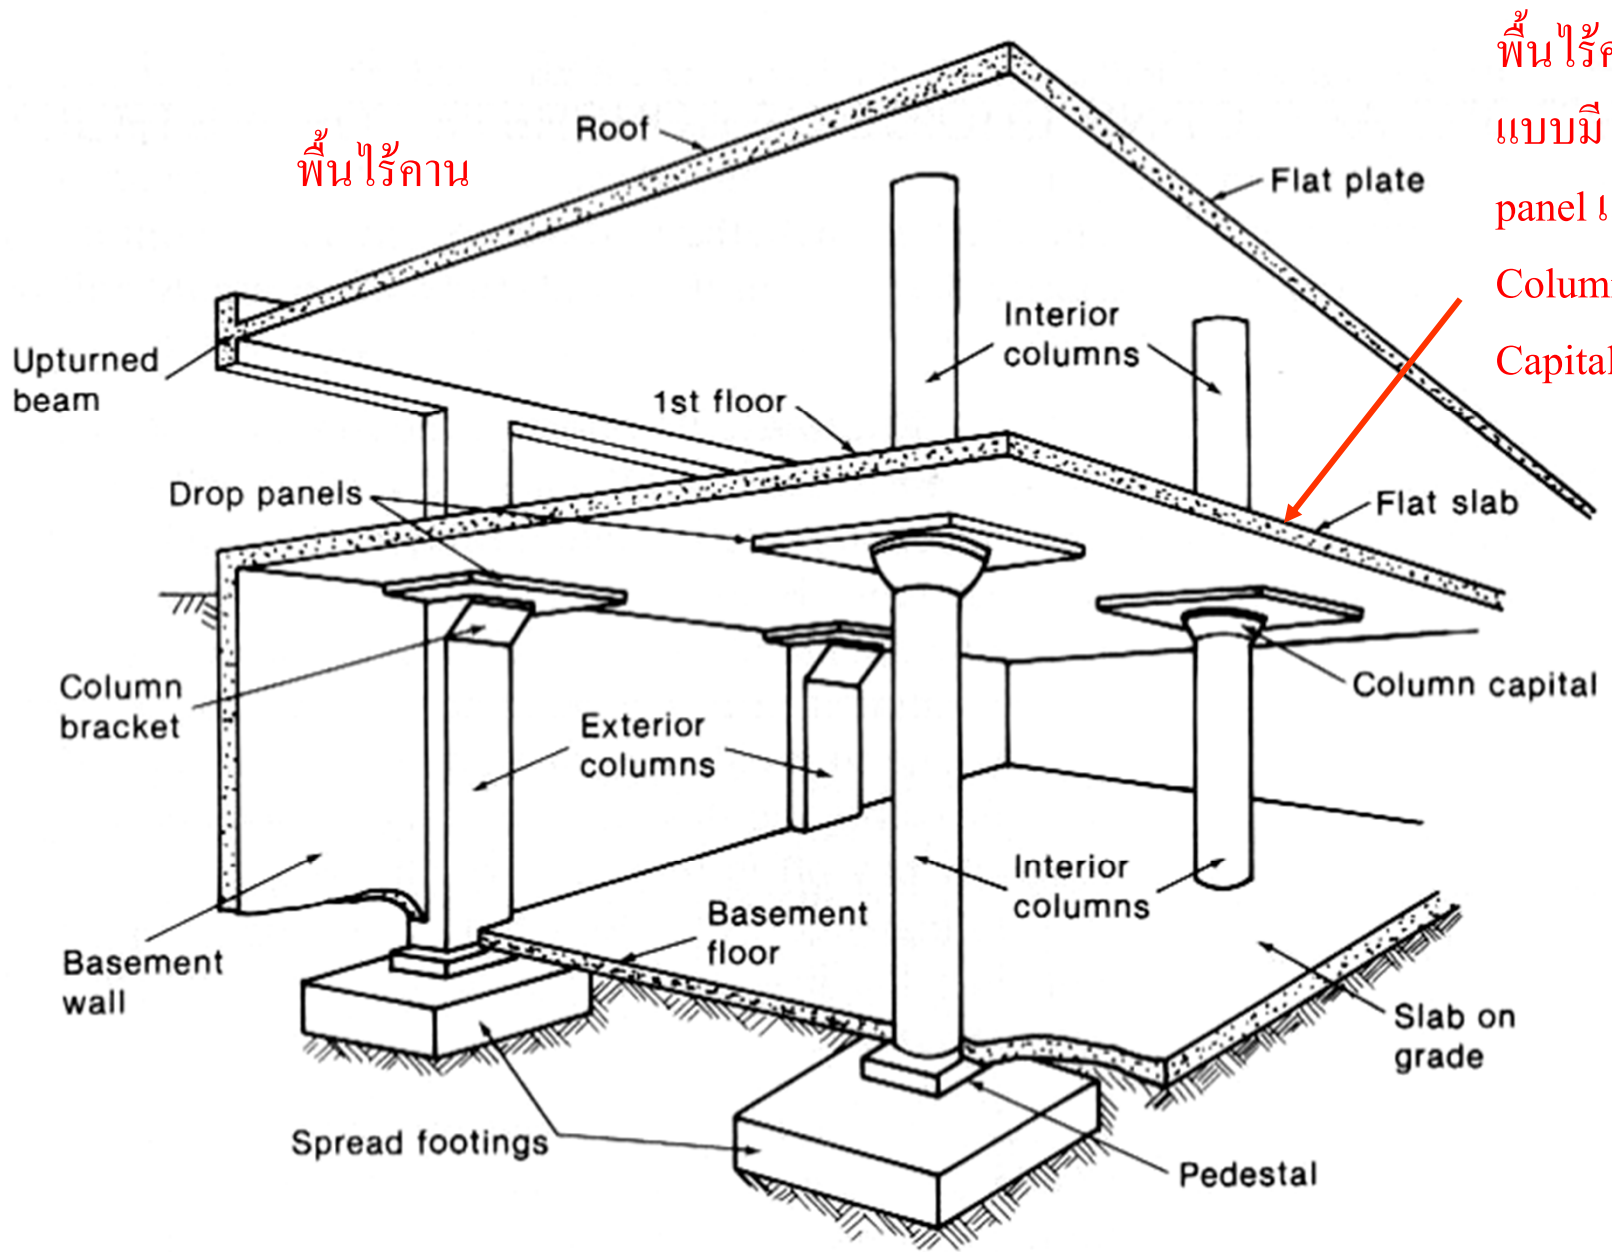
Reinforced concrete building elements. (Adapted from Ref. 1-2.)
